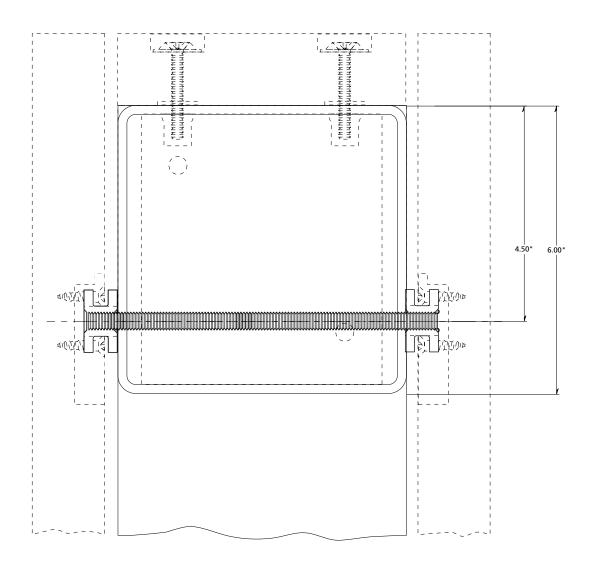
" x 6" RAIL PLUG FRONT ELEVATION
